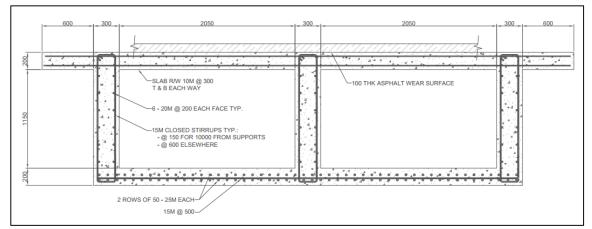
Precast Concrete Box Girder Preliminary Design Section (Alloy Consulting Ltd., 2015)
